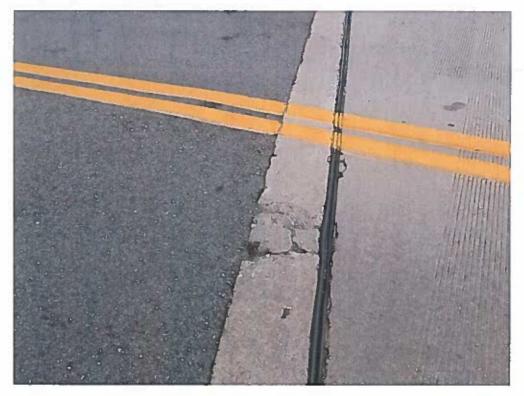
SPALL/DELAMINATION IN TOP OF ABUTMENT B BACKWALL.
